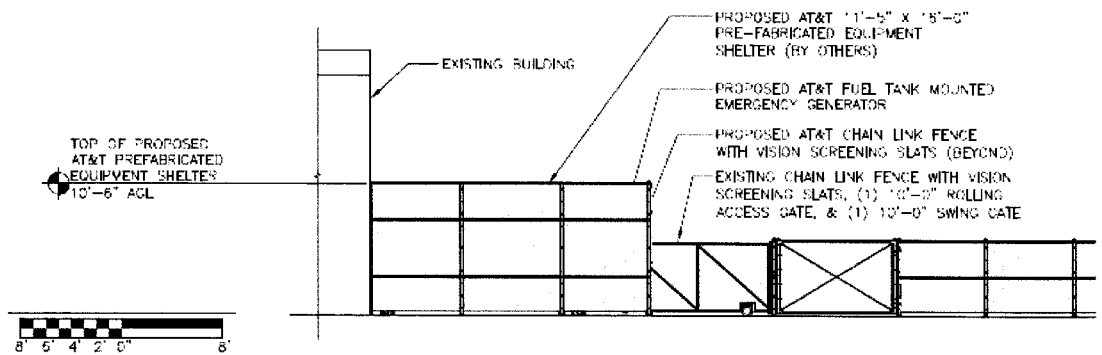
Modified project plan detail (Source: AT&T; scale incorporated by J. Kramer)
